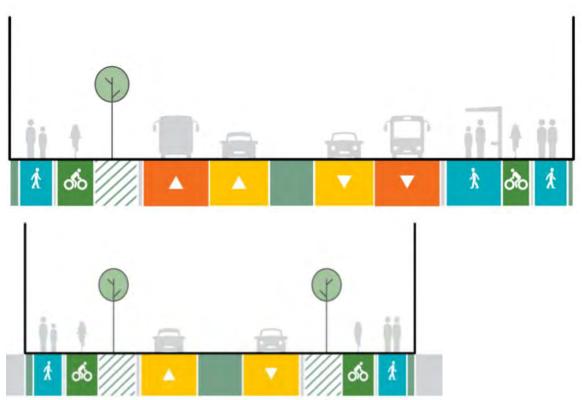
Hobsonville Road FTN Upgrade Typical Cross Sections (typical 30m and typical 24m)
